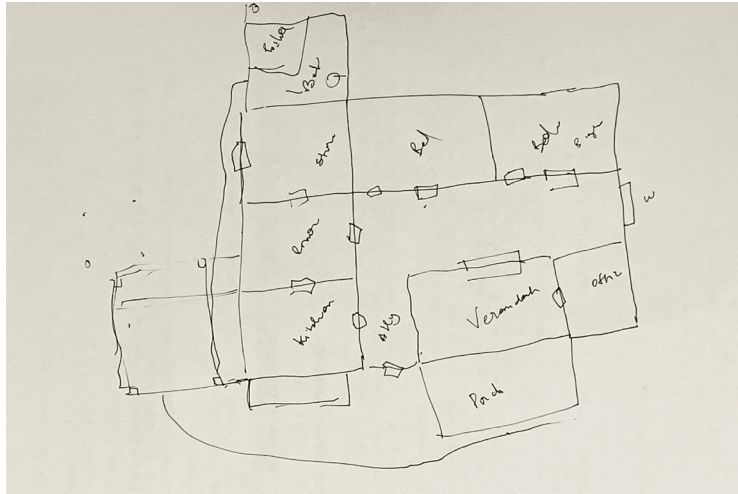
Sketch of the Jaffna floor plan by Appa, outlining the arrangement and naming of interior rooms.
